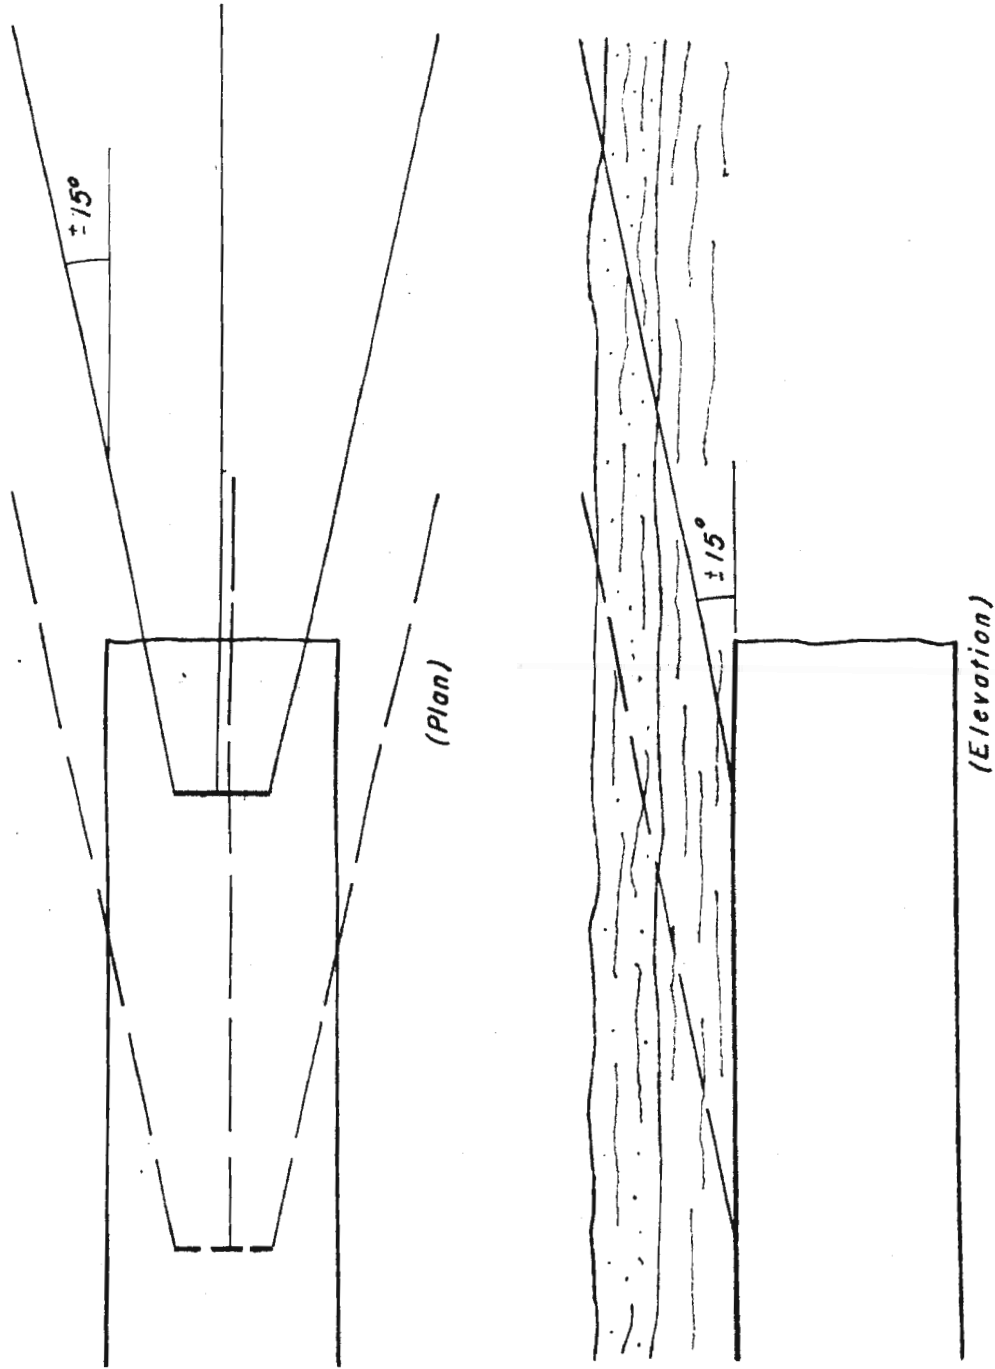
Drilling pattern for grouting a water-bearing stratum above a drift
